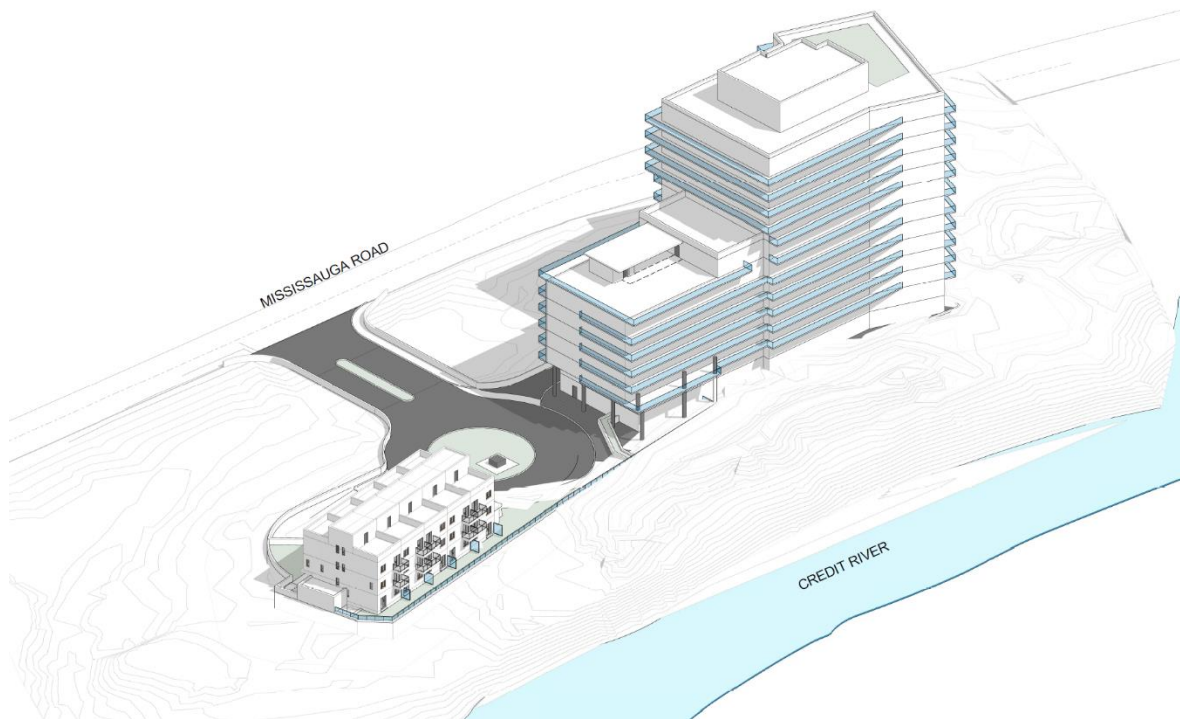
3D site overview looking southwest (Caricari Lee Architects, 2026)
